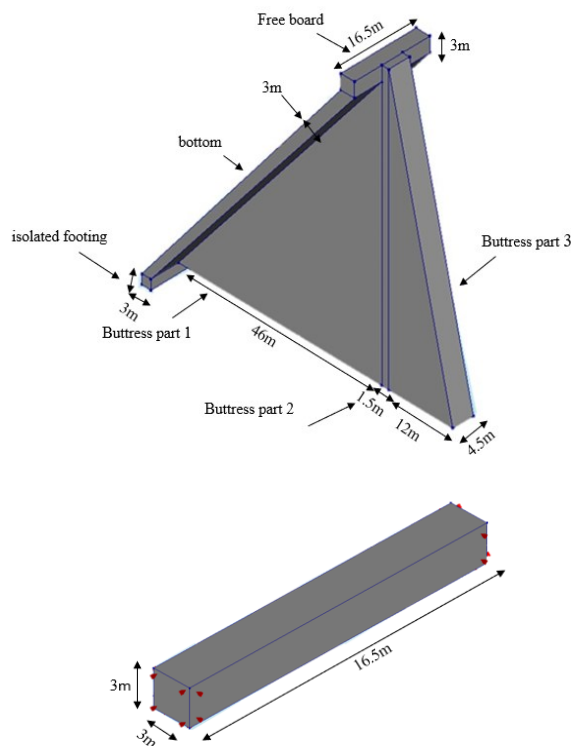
(a) Model of concrete buttress dam, (b) Model of foundation
